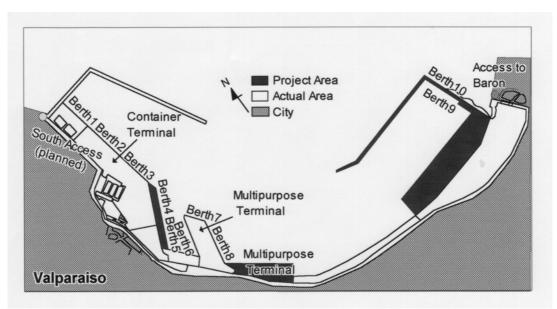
Layout and Project Site of Valparaiso Port
